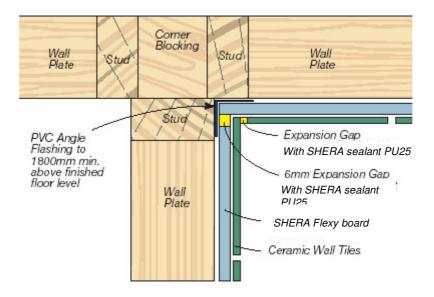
PVC Angle flashing at shower or shower over bath internal corner
